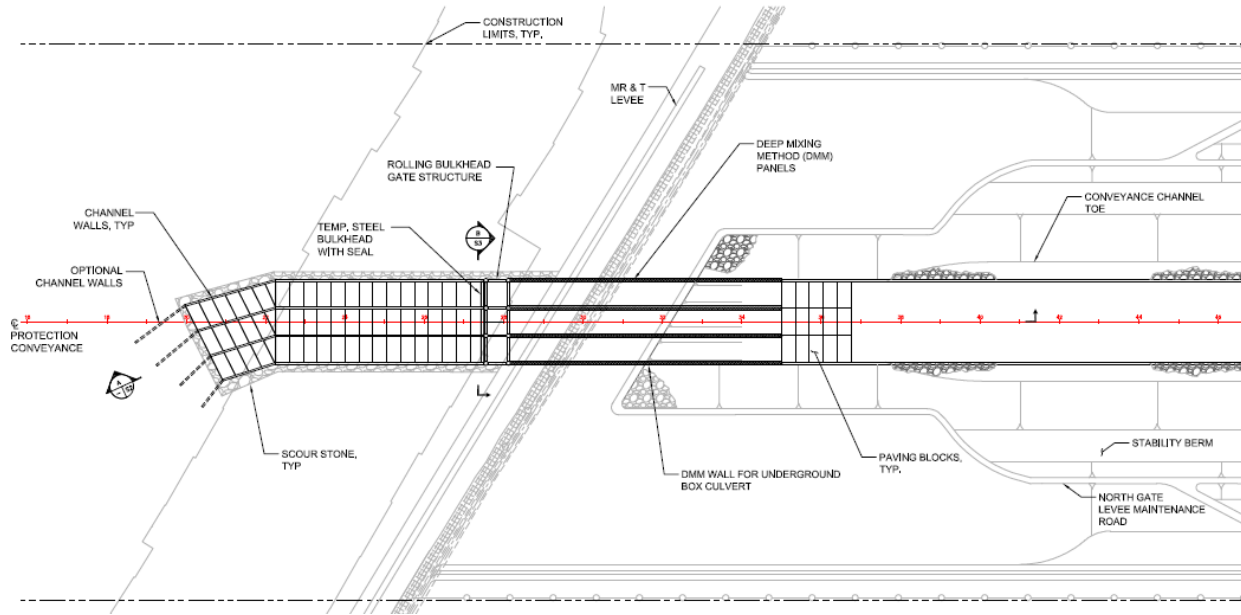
Alt. C – Plan View of the Inlet/Approach Channel, Control Structure, Submerged Box Culverts & Transition to the Conveyance Channel
